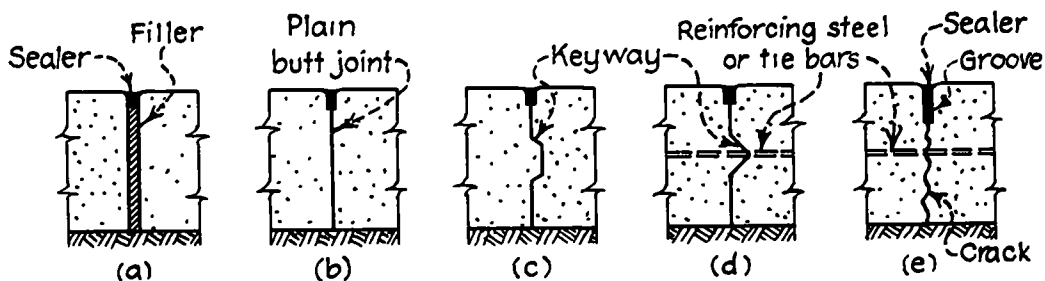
TYPICAL LONGITUDINAL JOINTS
